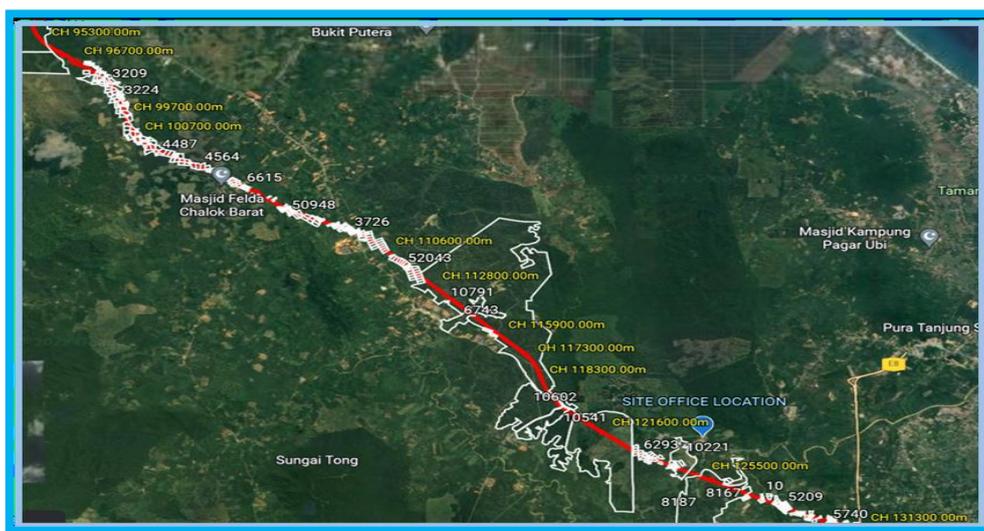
Layout plan for The East Coast Rail Link (ECRL) located in Setiu, Terengganu as Section 3
